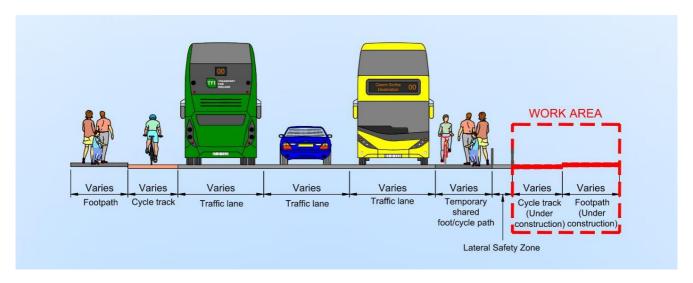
Traffic Management Cross Section, Section 2 - Stages 1 & 2
